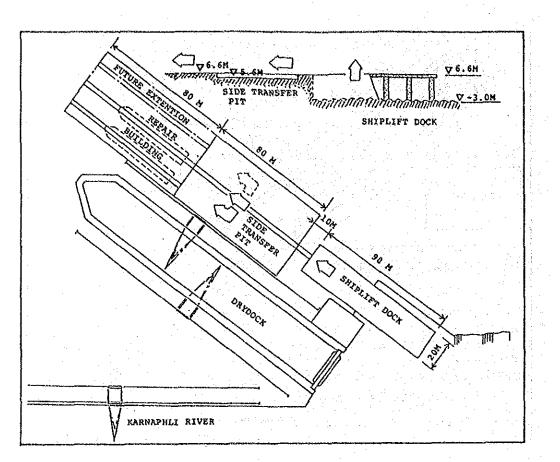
Shiplift System ( PLAN "C" )
